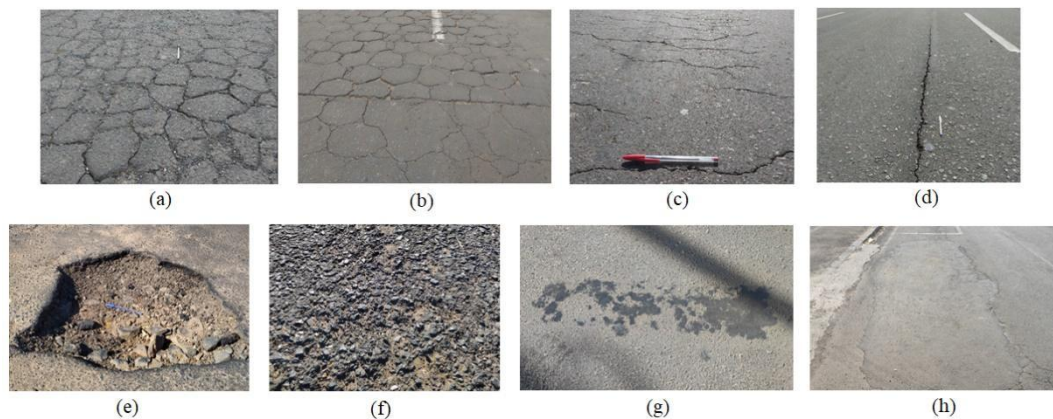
Types of damage in asphalt pavements: (a) alligator crack (b) block cracks (c) transverse cracks (d) longitudinal crack (e) pothole (f) raveling (h) patch (some images were taken with a pen image next to the pavement distresses to understand the size of damage).
